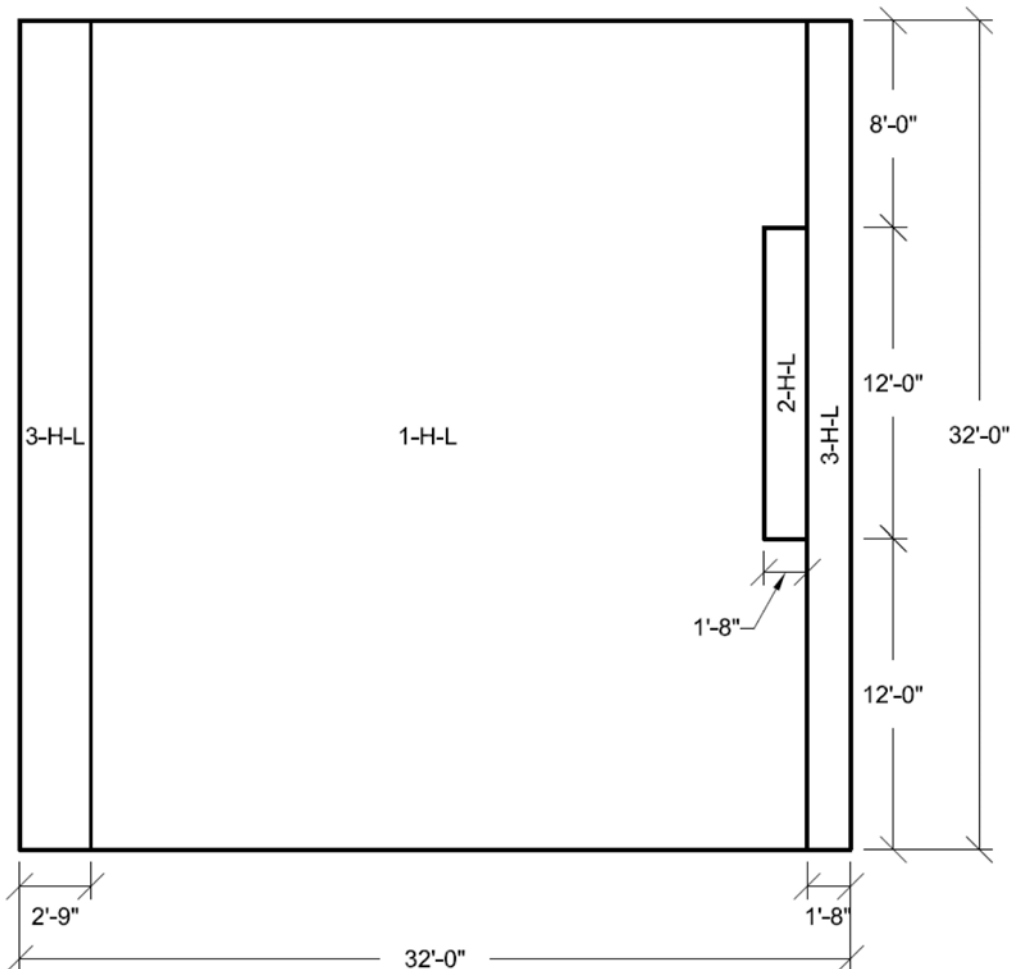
H.6-185 DGFOV Wall 12 Looking From Outside
